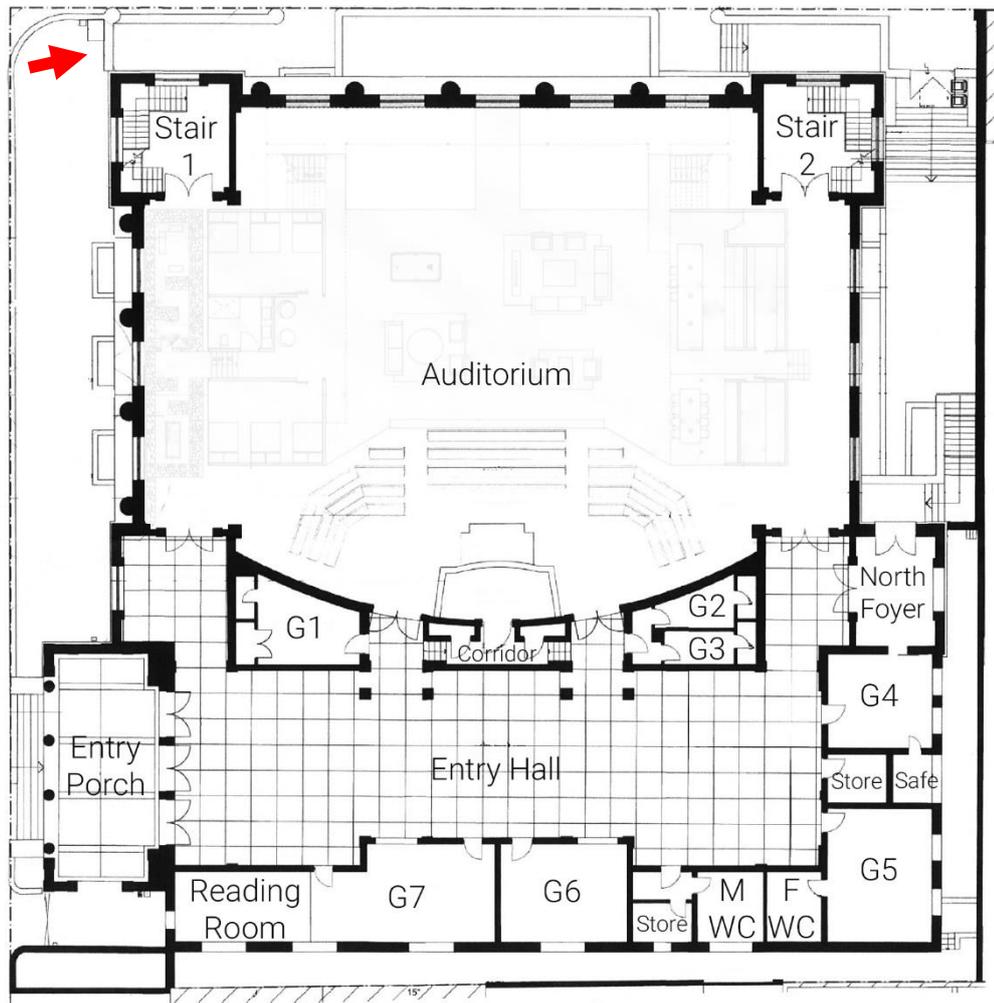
First Floor Plan. (Source: BatesSmart plan with notes by NBRARCHITECTURE)
